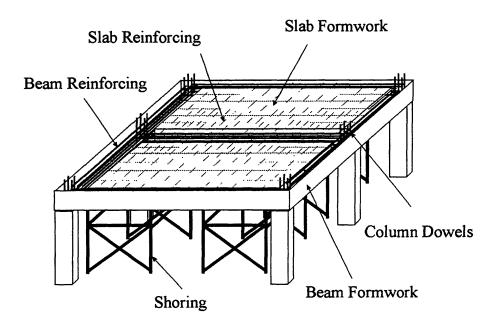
Typical Slab/Beam Formwork System Awaiting Monolithic Concrete Placement
